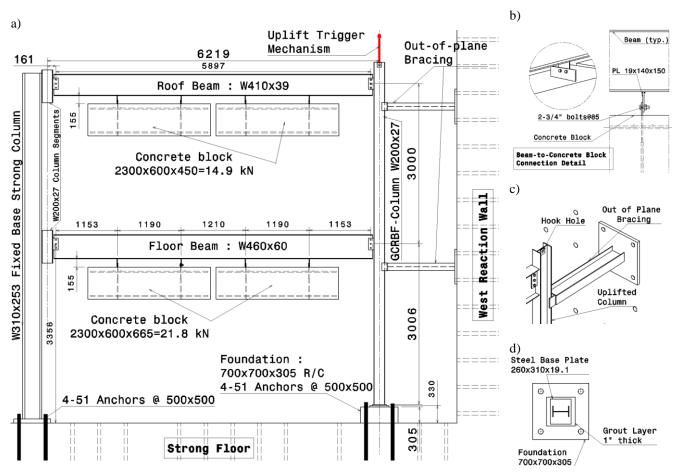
Test setup: (a) Elevation view; (b) Detail of beam-to-mass connections; (c) Detail of the column guides; and (d)
